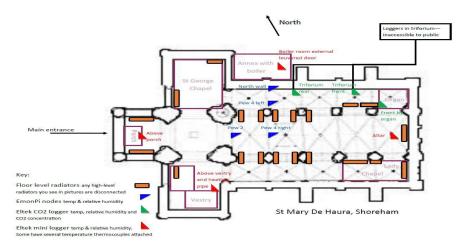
The floor plan of the church showing the position of radiators, loggers and sensors installed
